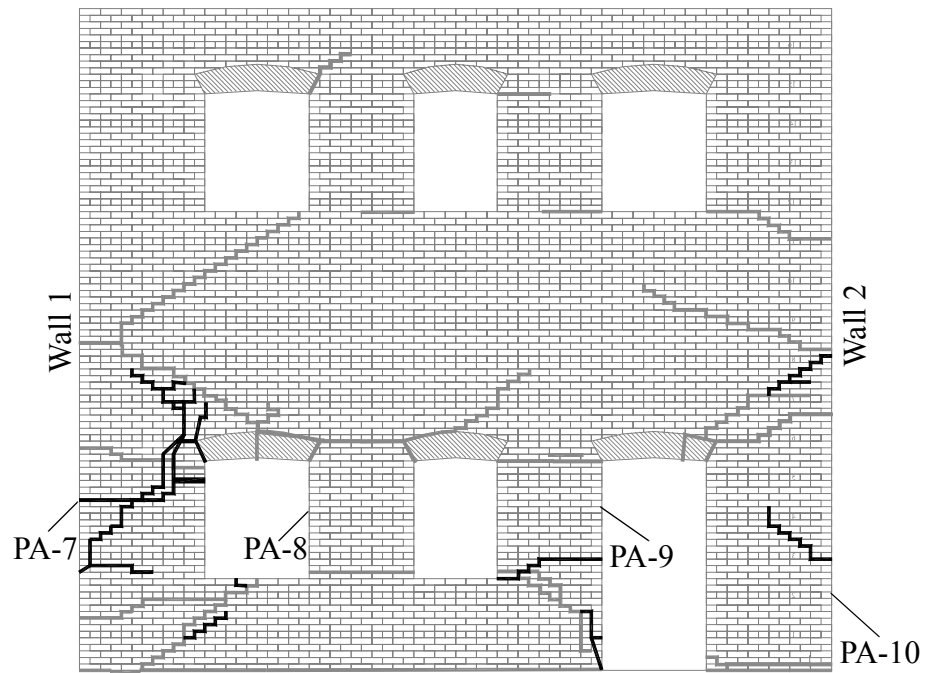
Crack pattern in Wall A following Test Run 39.
